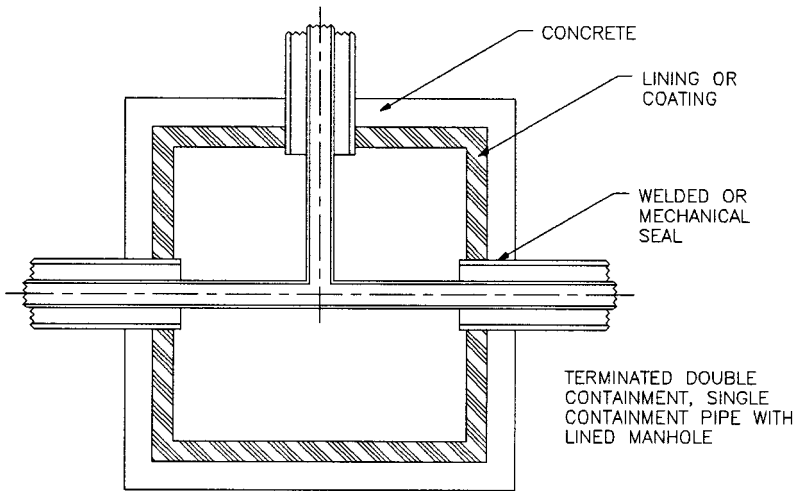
Plan details for manhole MH01 from Fig. B13.69.
